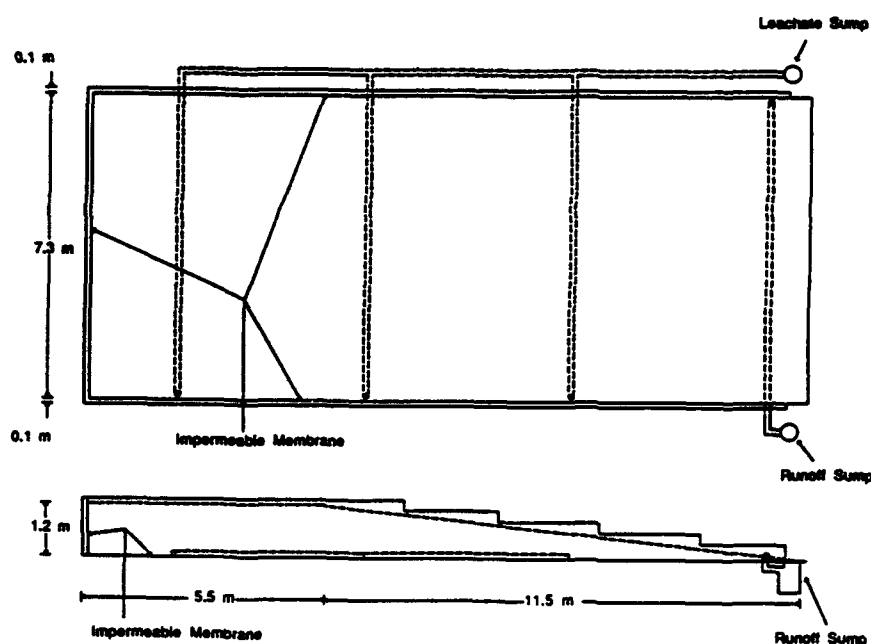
OSU FGD By-Product Truck Ramp, Plan and Section View.
